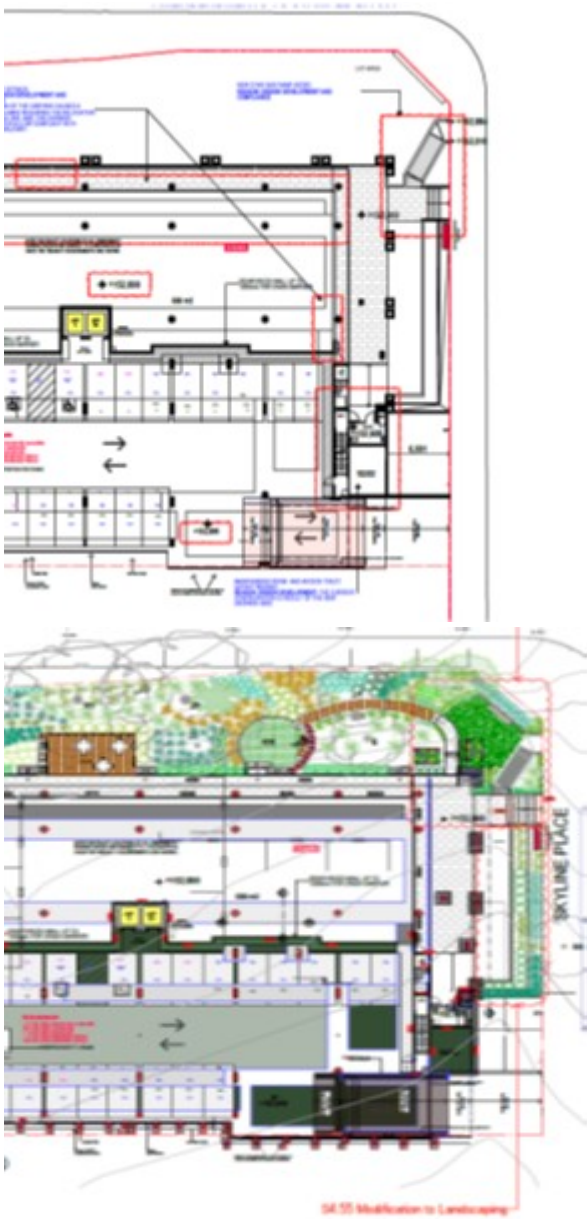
Mod Architectural Plans with terrace to Skyline PI. Fig 2. Mod Landscape Plan with terrace to Skyline PI.
